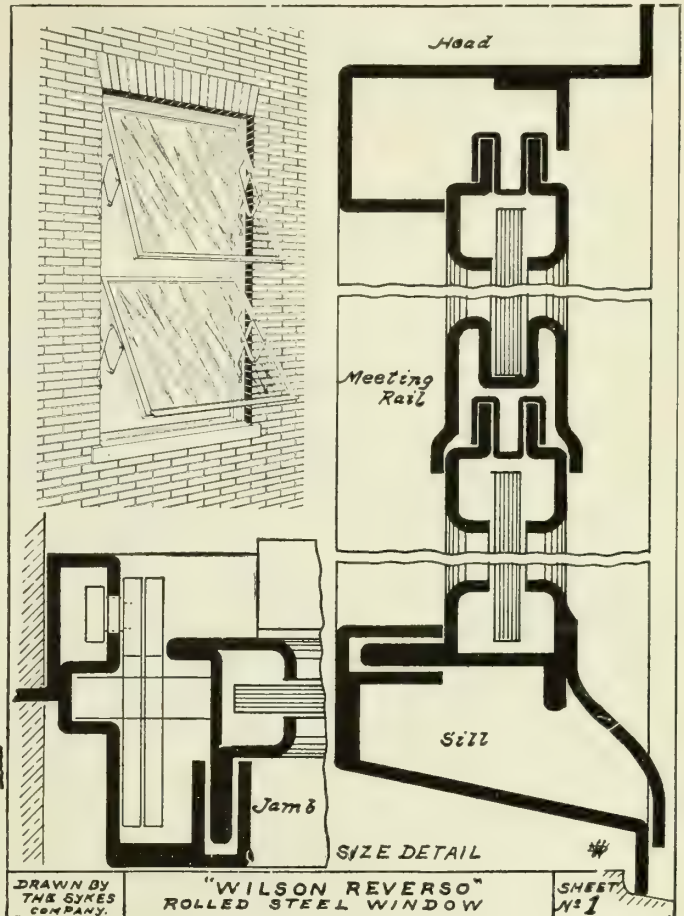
DETAILS DOUBLE HUNG, ROLLED STEEL SASH
